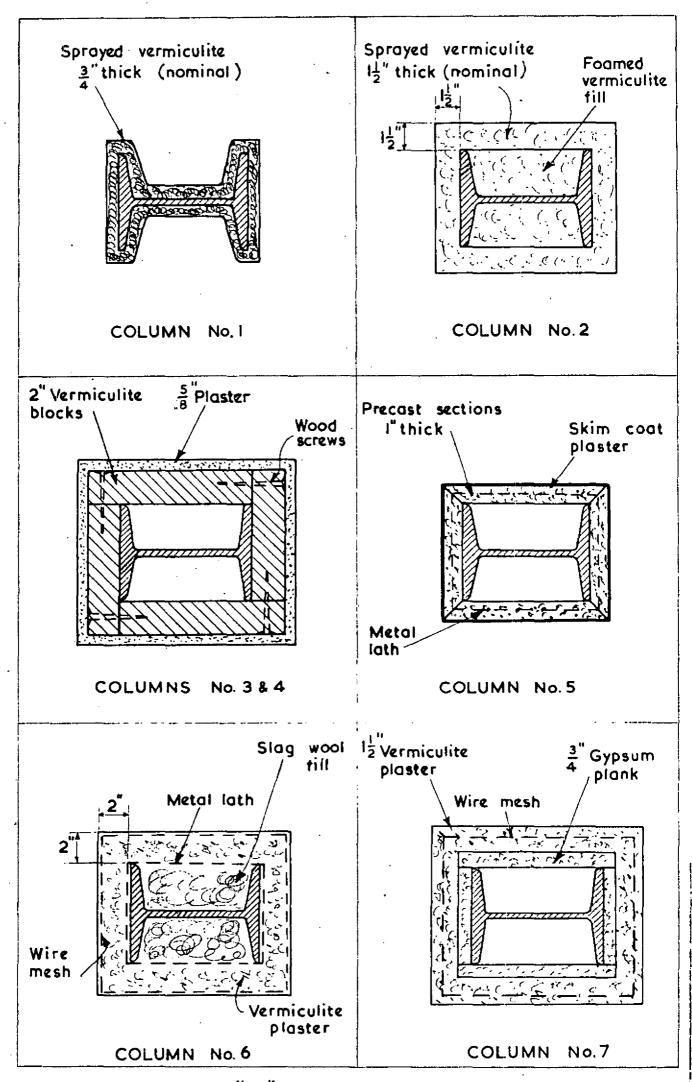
FIG.I. STANDARD STEEL COLUMN FOR FIRE TEST
